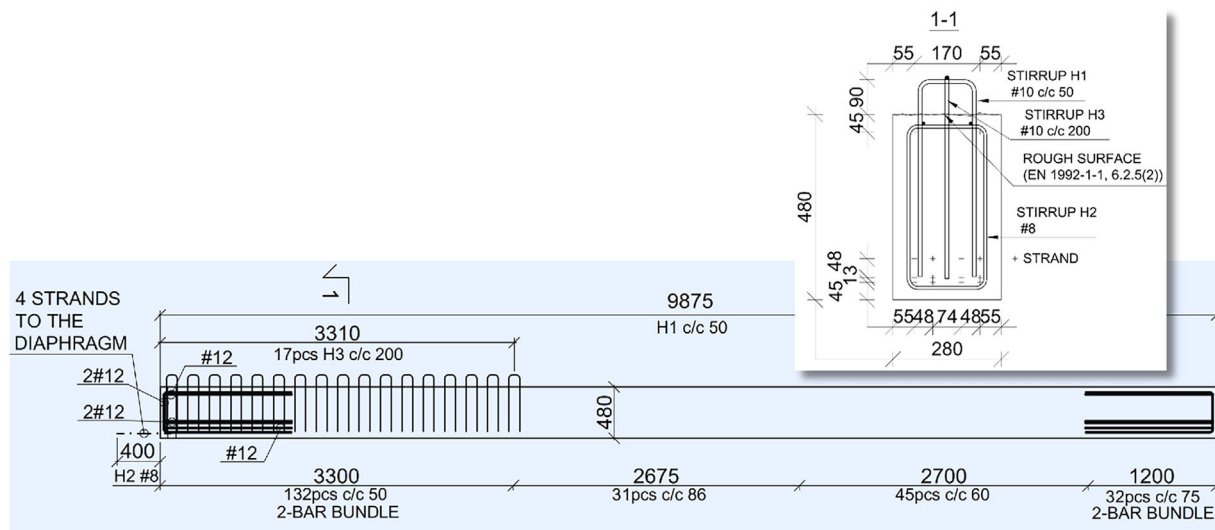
Reinforcement of precast prestressed test beams (unit of length in the figure is mm).
